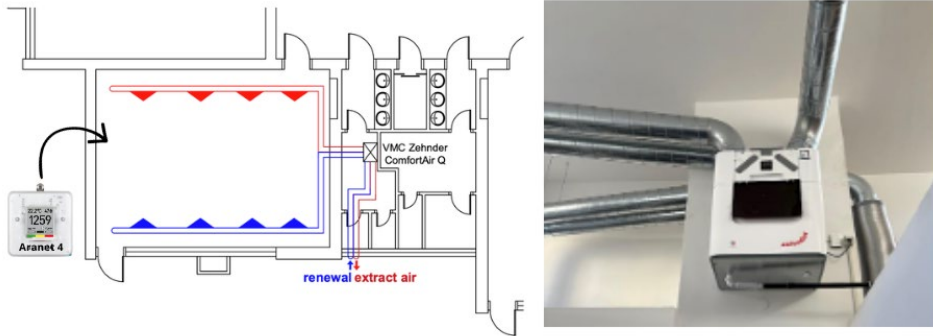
Floor plan and monitoring setup for the Bolzano classroom.
